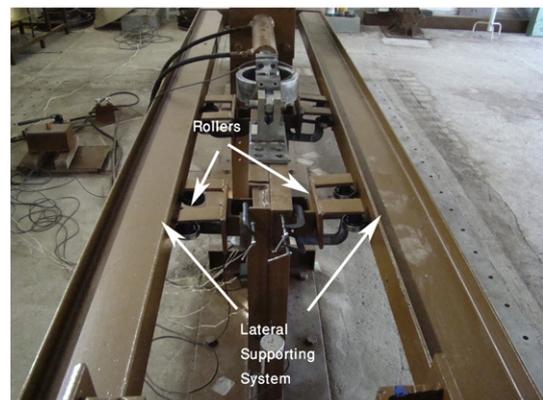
Lateral bracing system of the SPW specimen in the laboratory.
